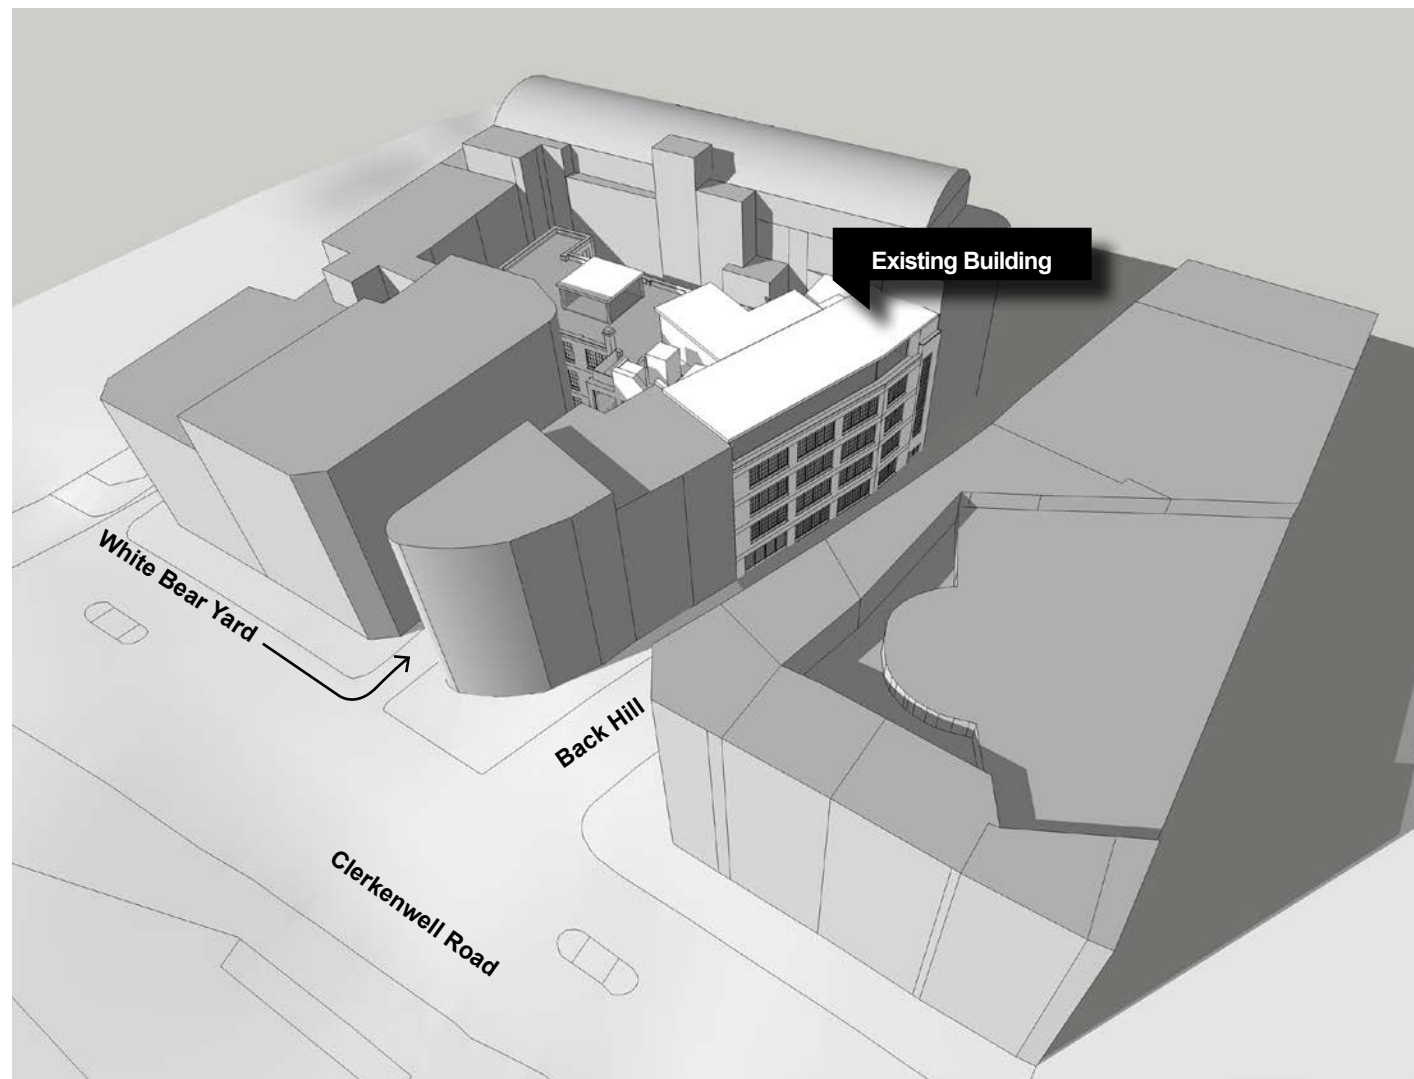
| EXISTING BUILDING IN MASSING CONTEXT
